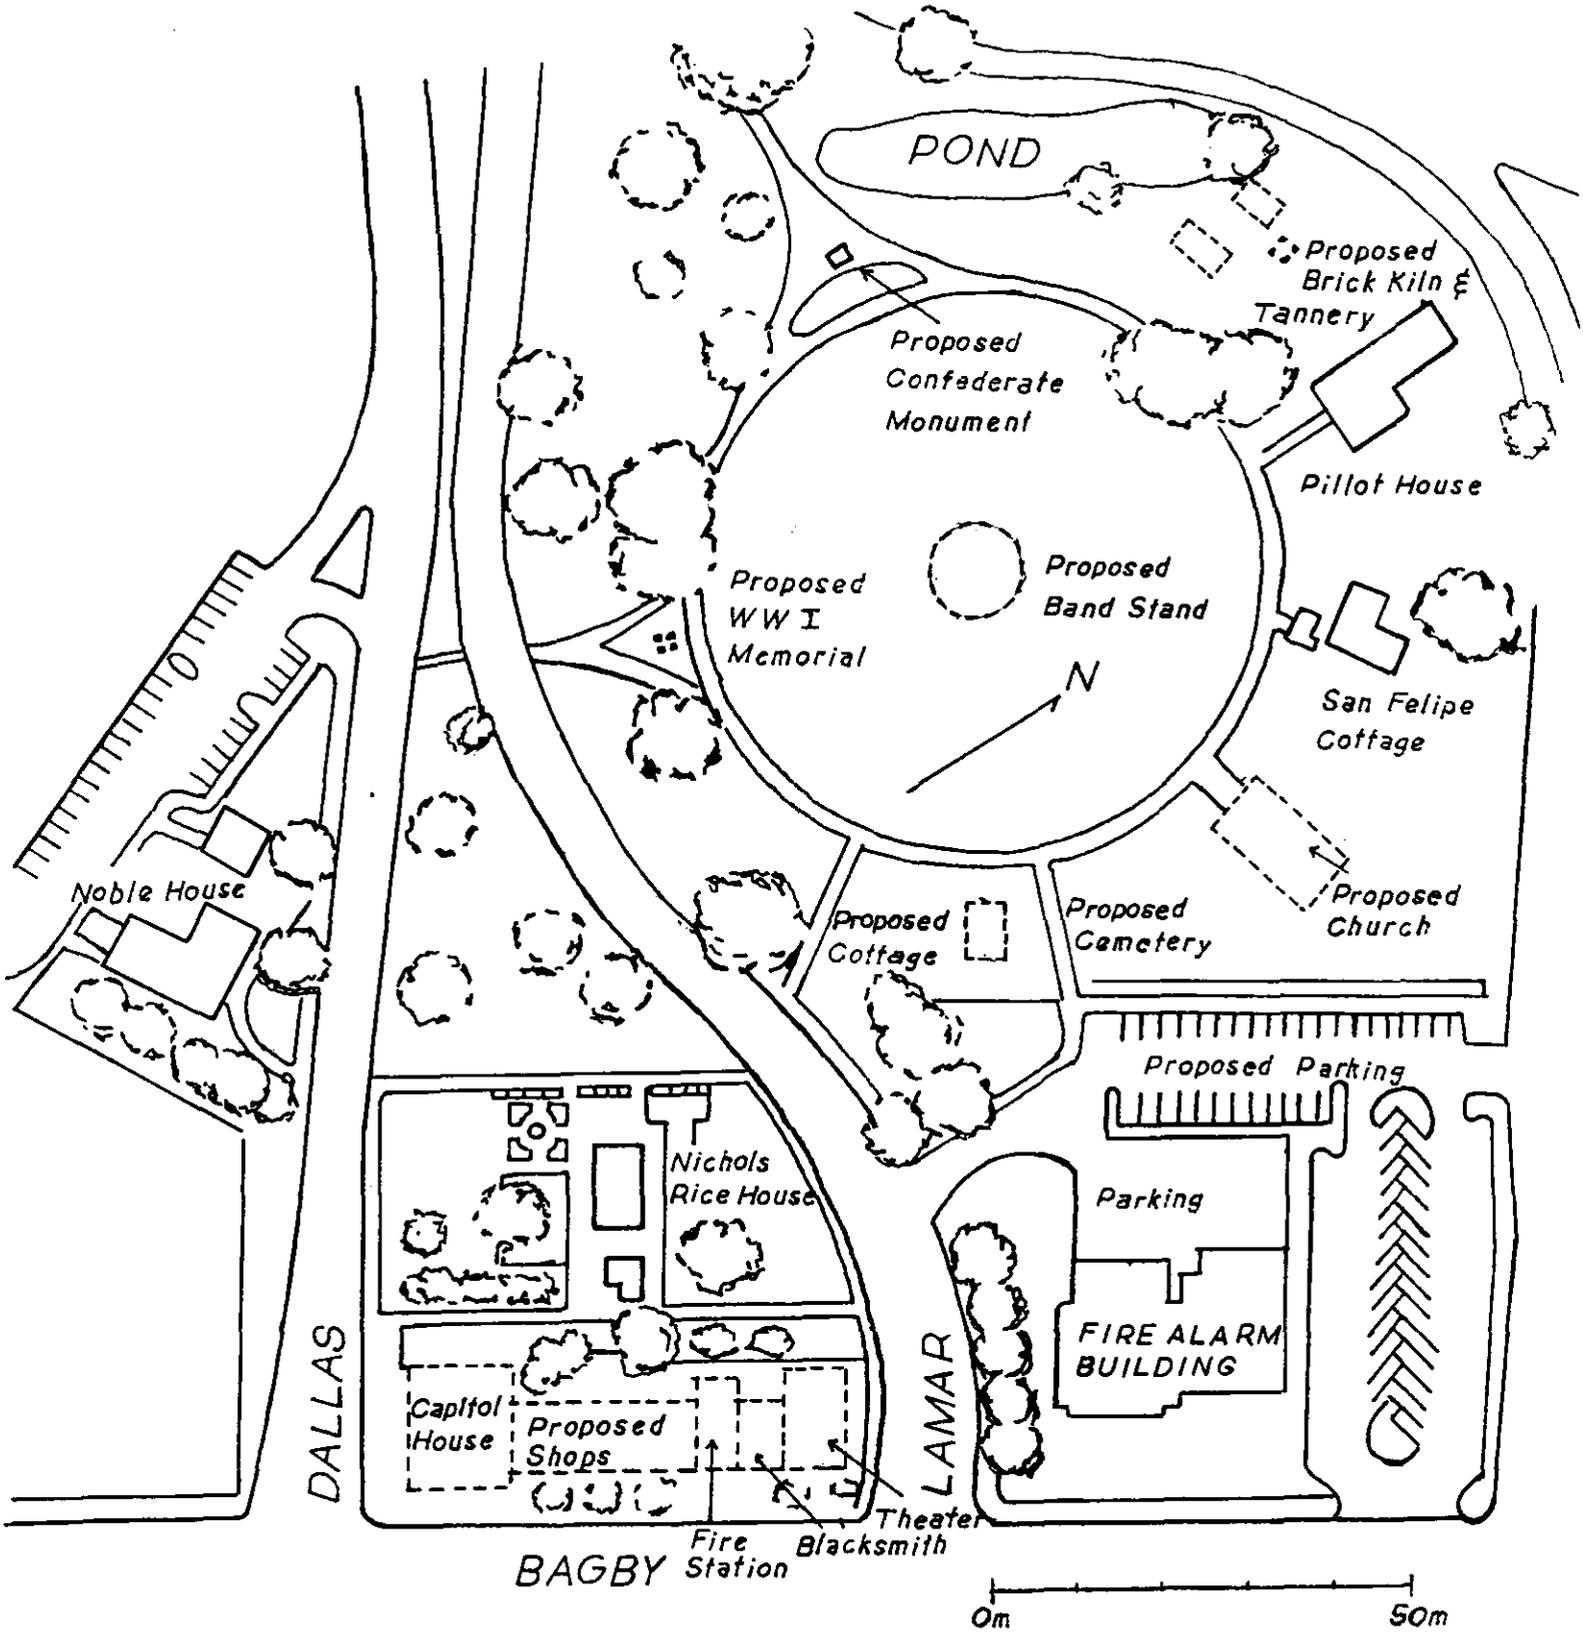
1967 Harris County Heritage Society Plan for Sam Houston Park Showing Position of the Long Row Building and Nichols-Rice-Cherry House between Dallas and Lamar Streets.
